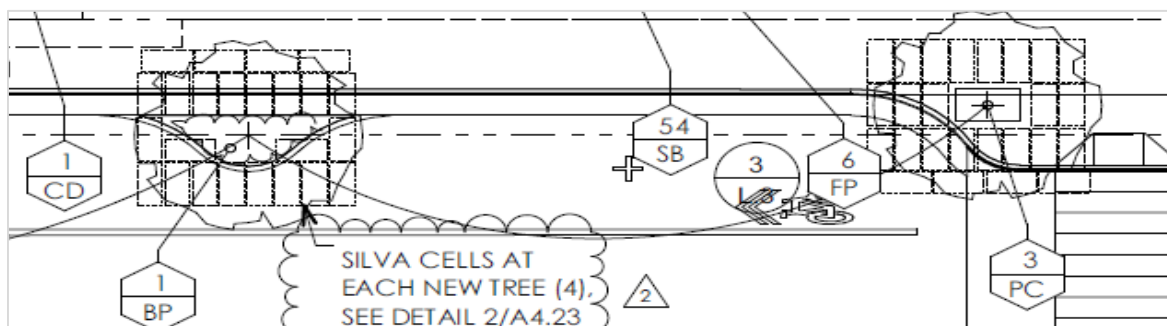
Overhead view of Silva Cell installation in public right-of-way under new trees to be planted in curb bulb-outs for new commercial development project (2555 Park Blvd, Palo Alto).
